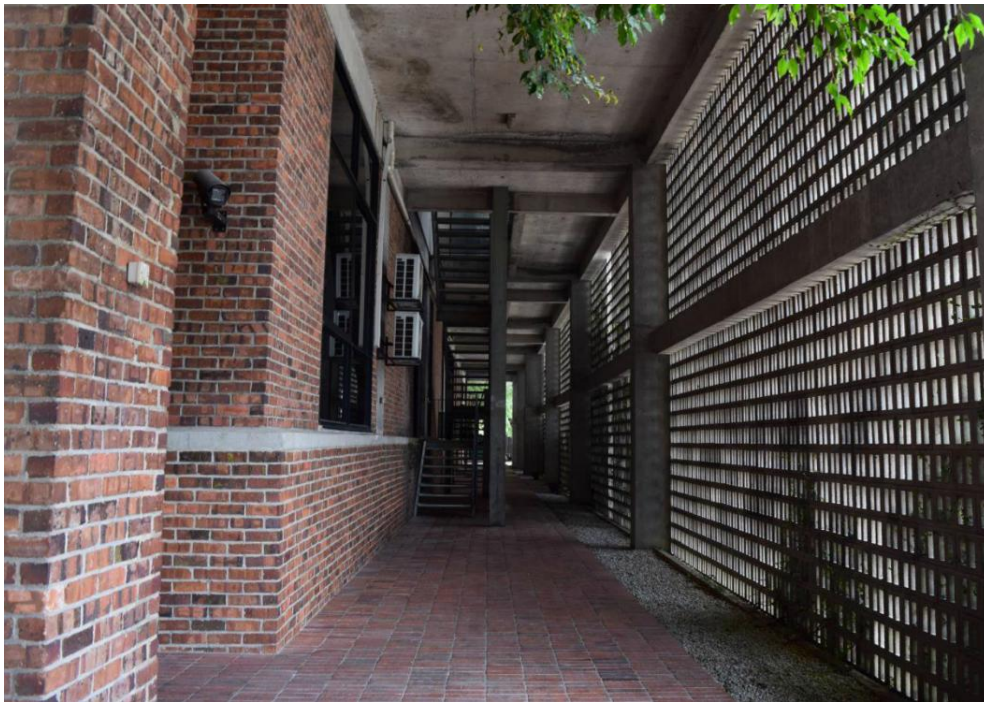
Wall and flooring made of red mud over-burnt bricks at PJ Trade Centre
